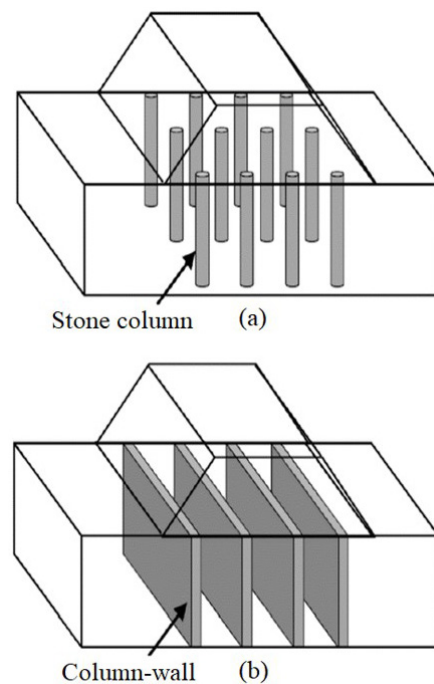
Embankment on soft soil supported by stone columns: (a) individual columns; (b) column-walls.
